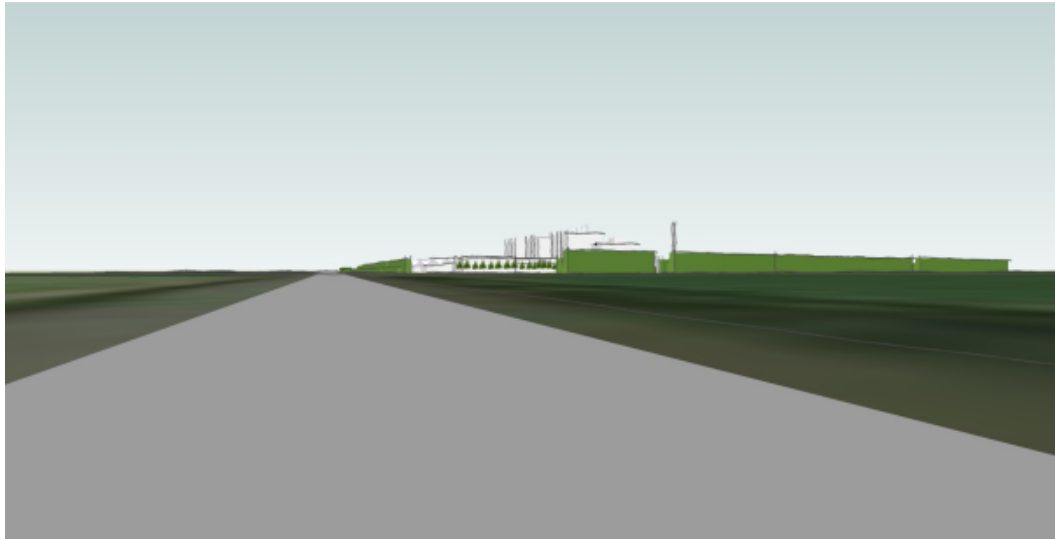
View towards the site from SH1 approximately 500m southwest of Parkins Road showing established planting and potential Stage 1 and 2 building development. (Note: excludes substation from view)
